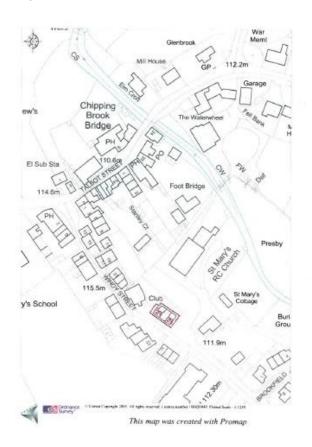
, Location plan highlighting properties 29 & 33 Windy Street
